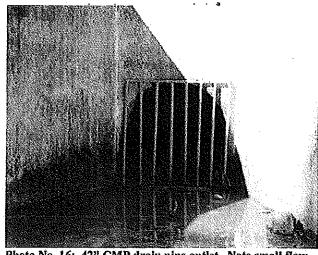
42" CMP drain pipe outlet. Note small flow.
